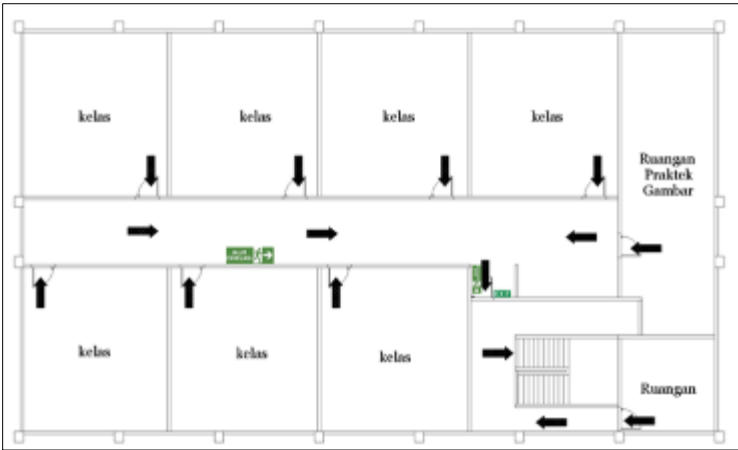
Evacuation Route for Civil Engineering Department, 3rd Floor
